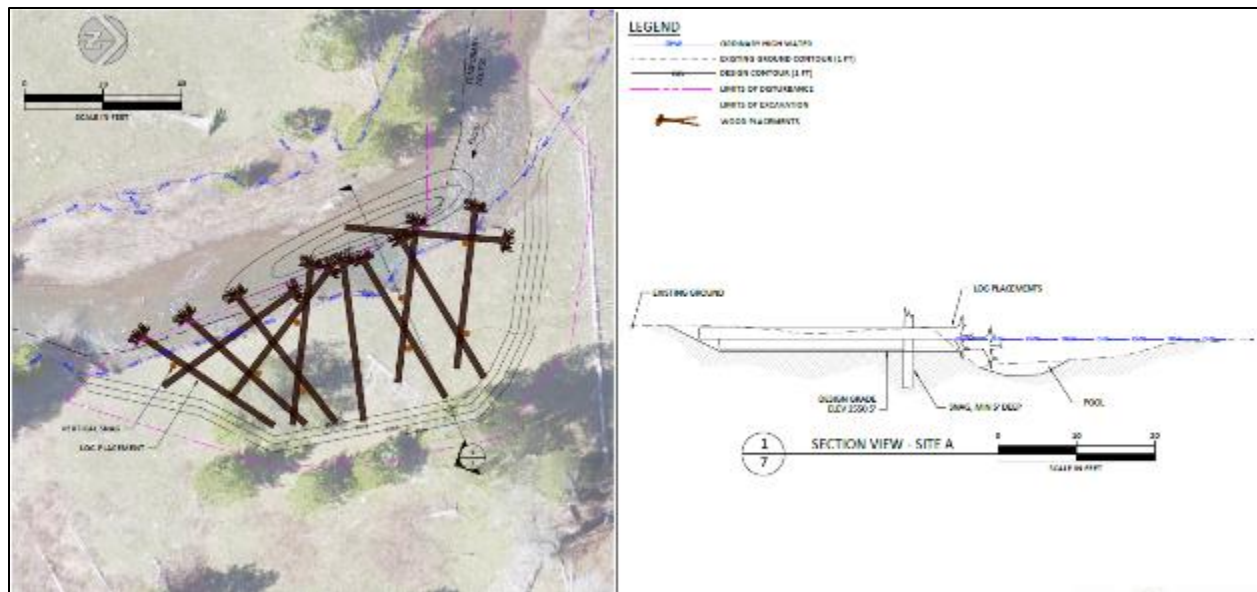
Plan view of Site A depicting log configuration, excavated pool and floodplain terrace.
